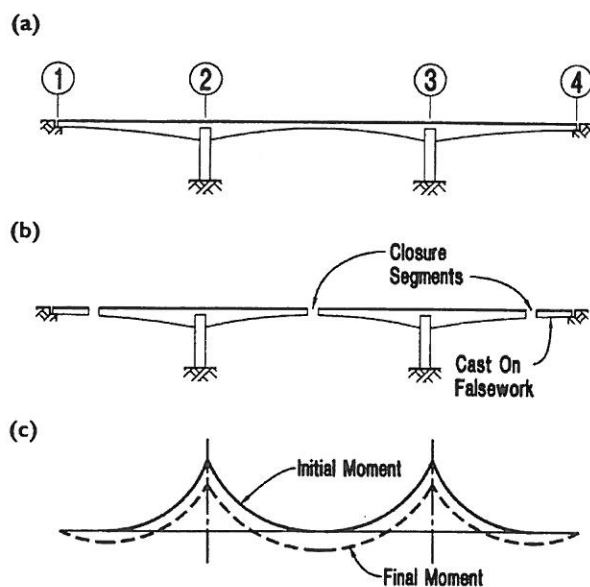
Balanced cantilever bridge construction: (a) span arrangement, (b) construction phase arrangement, (c) redistribution of moments
